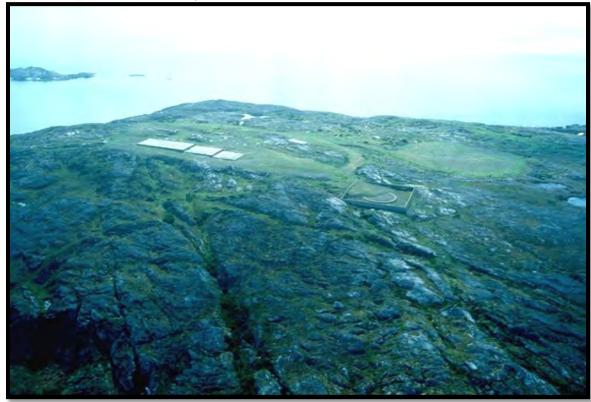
View, looking east, towards the upper Site foundation remains of the main building, disaster shack, and the AST - July 2002.
